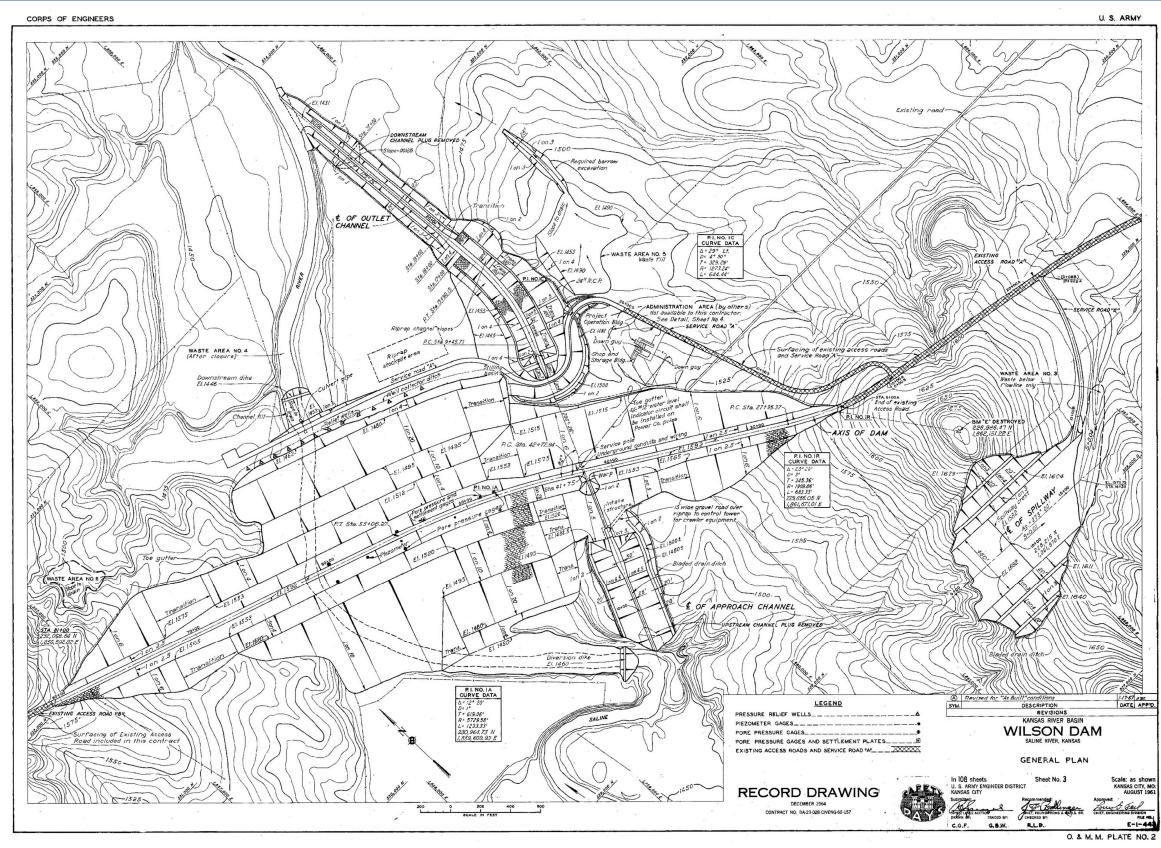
Wilson Dam General Plan, Elevations are in NVGD29.
